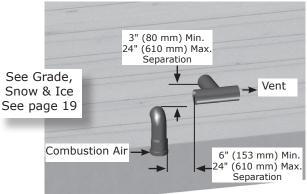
(3" / 80 mm ONLY) Twin Pipe Side Wall with 45° Vent
